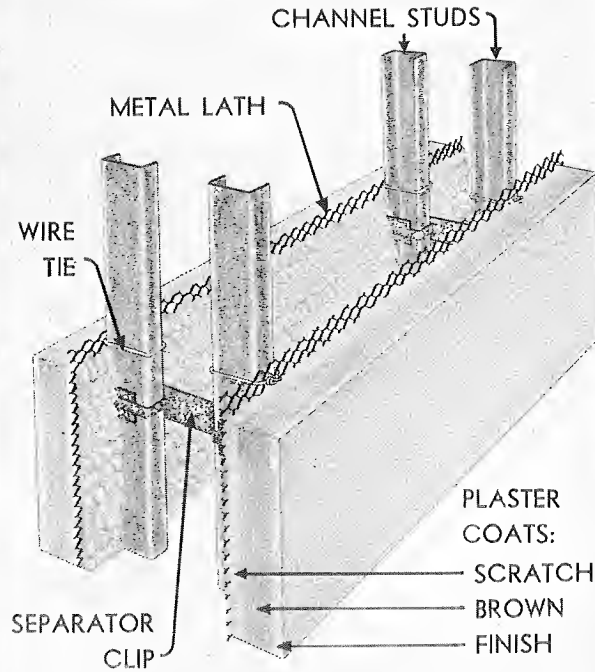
Metal Lath and Plaster Channel Stud Hollow Partition, Showing Stud Assembly of Double Channels With Clips. Prefabricated Steel Studs (See PLATE III, Page 92) Are Widely Used for This Purpose.
